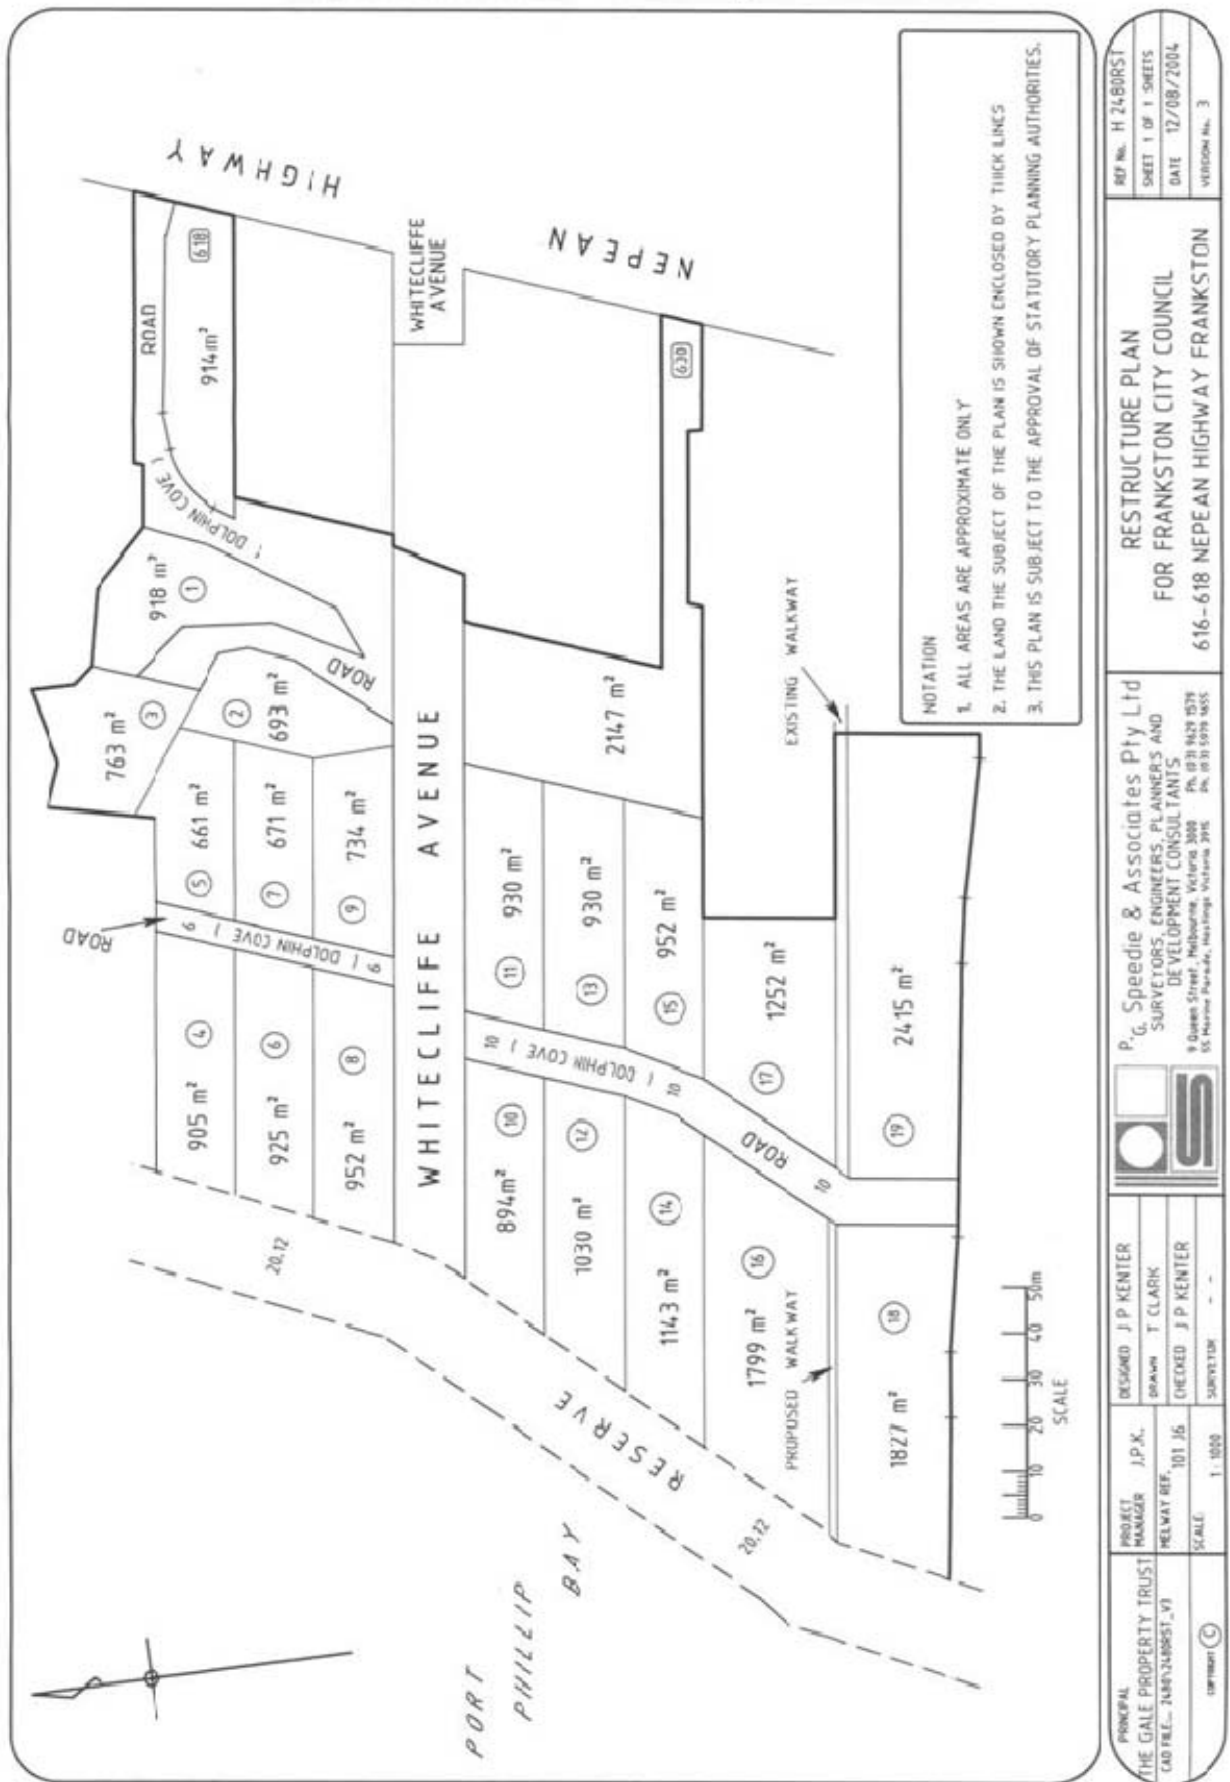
Olivers Hill Lot Restructuring Plan Sheet 1
